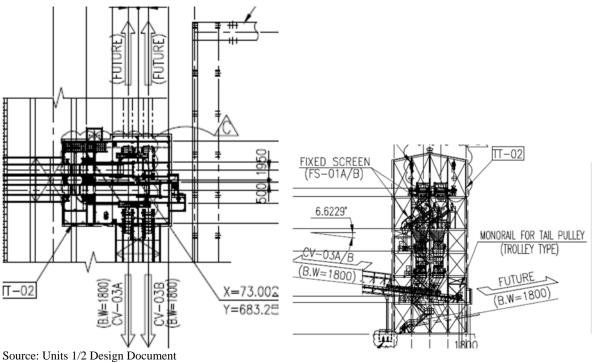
Branch Point of No.2 Transfer Tower
